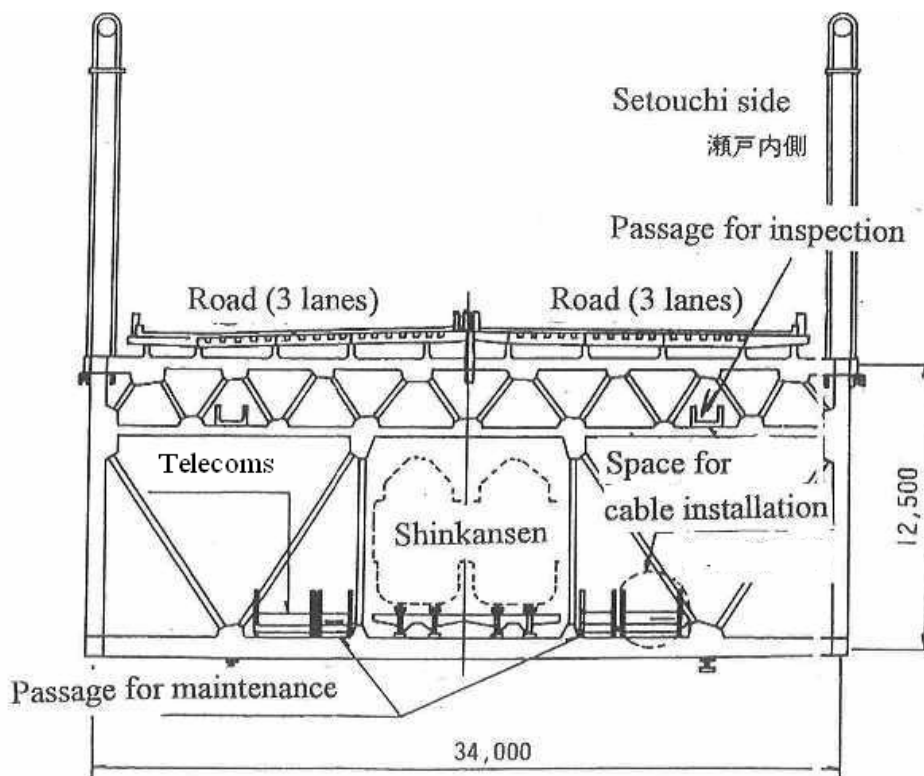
Typical Cross Section of a suspension bridge in Kansai
